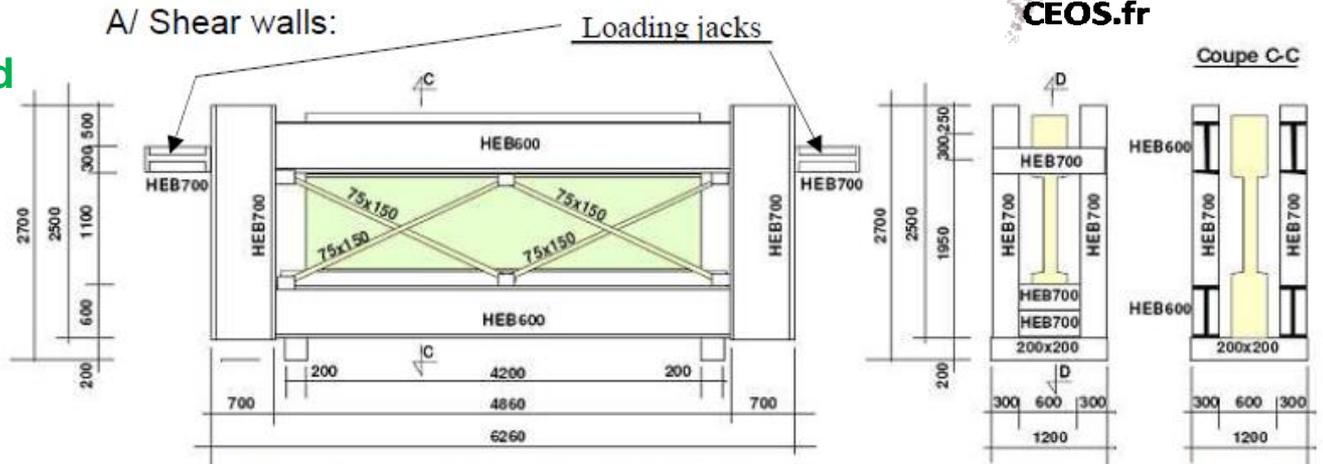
Shear wall specimens – left: wall on its testing bench- right: sectional elevation of the wall
